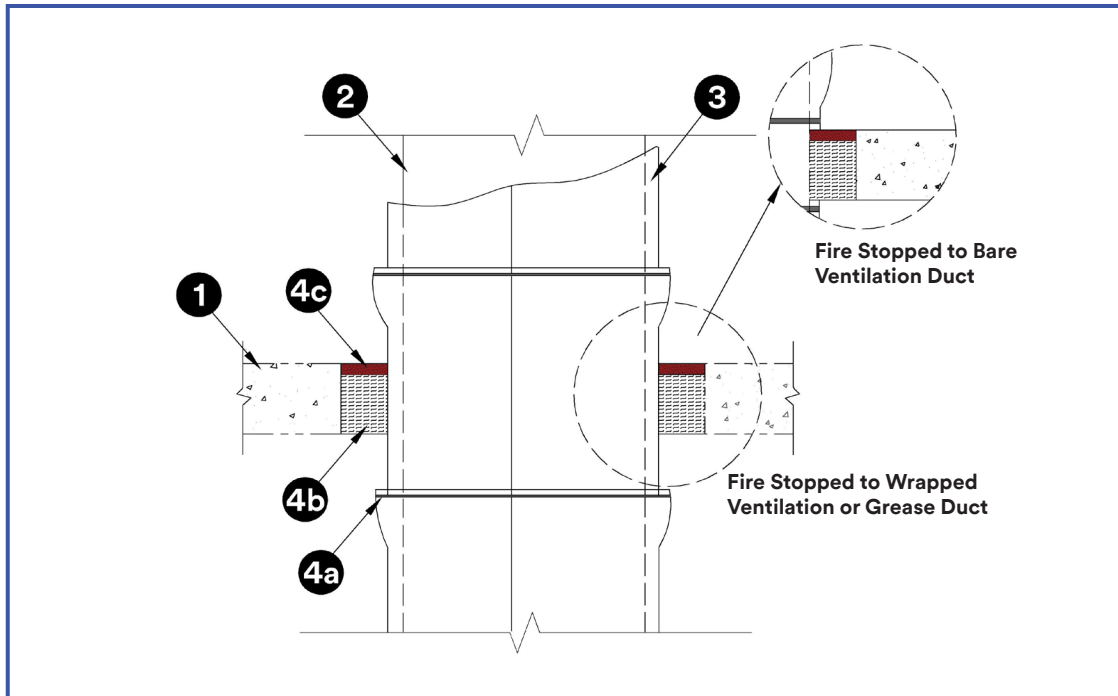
3M™ Fire Barrier Duct Wrap 615+ continuous (and terminated) through a 1 or 2-hour fire-resistance rated concrete slab / wall assembly
